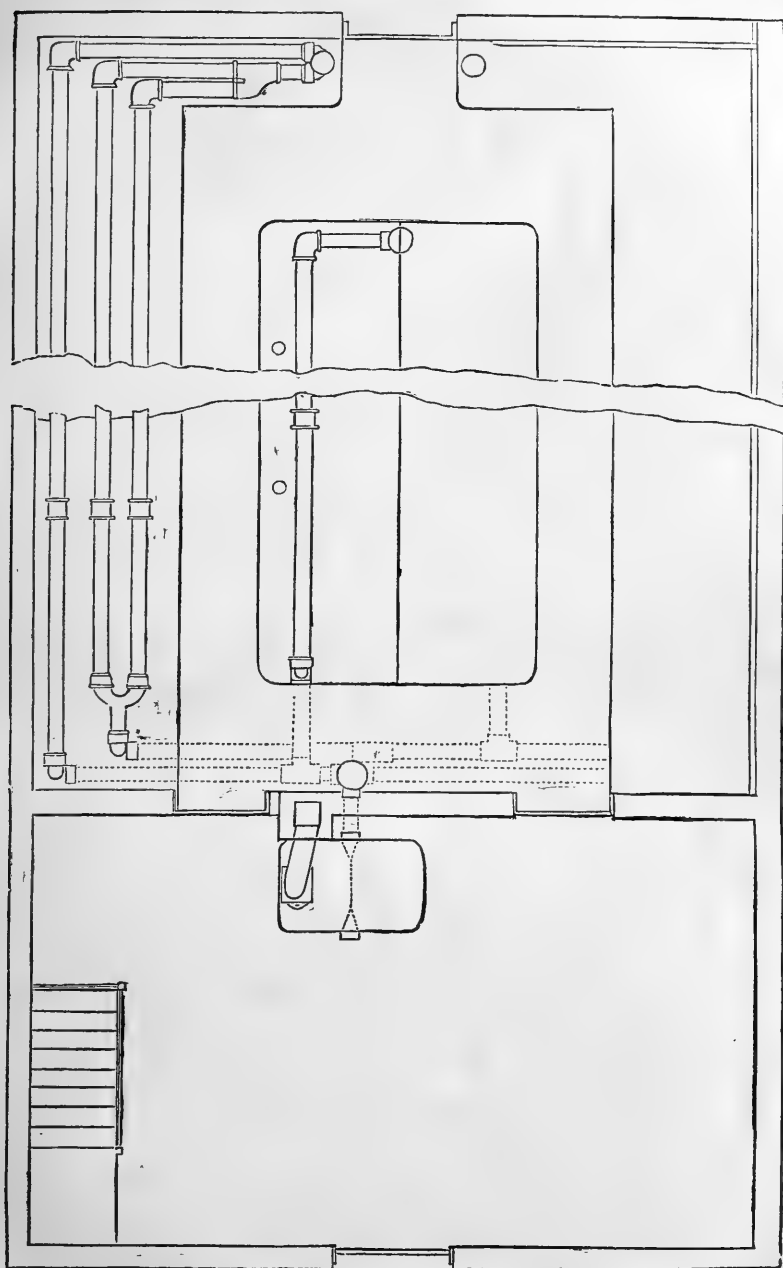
GROUND PLAN OF FORCING HOUSE.
